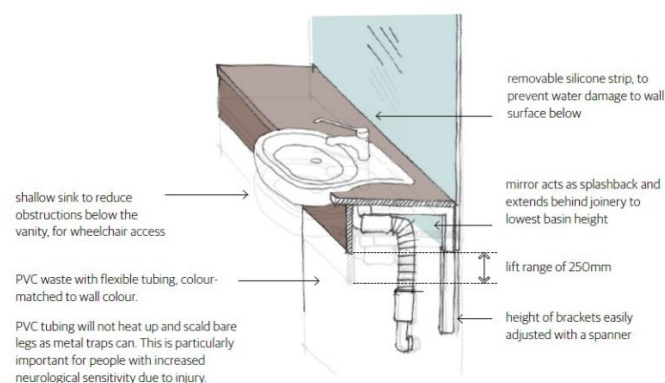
SUMMER FOUNDATION ADJUSTABLE BASIN DESIGN
